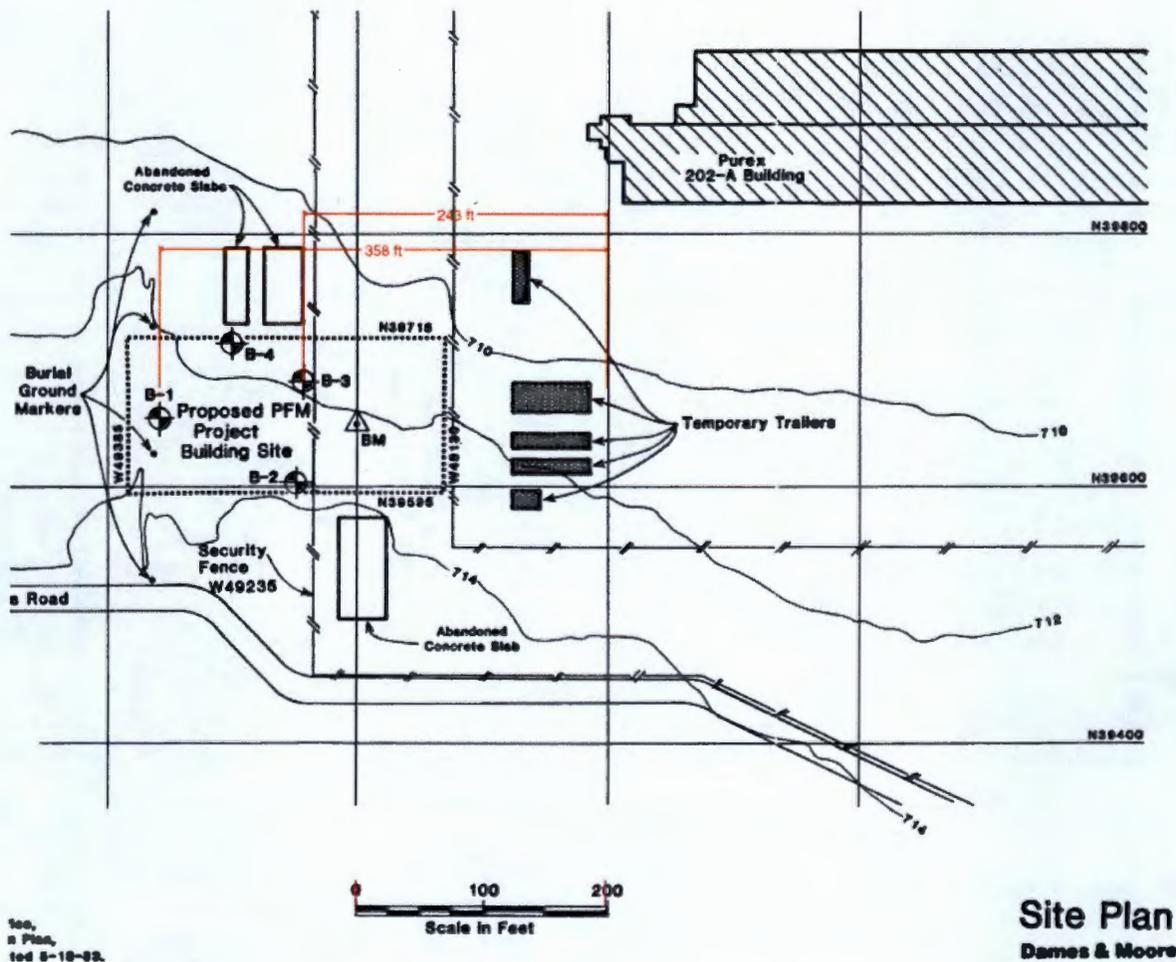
Dames & Moore Site Plan Showing Borehole Locations relative to PUREX Facility. Purex storage tunnels are not shown in this view.
